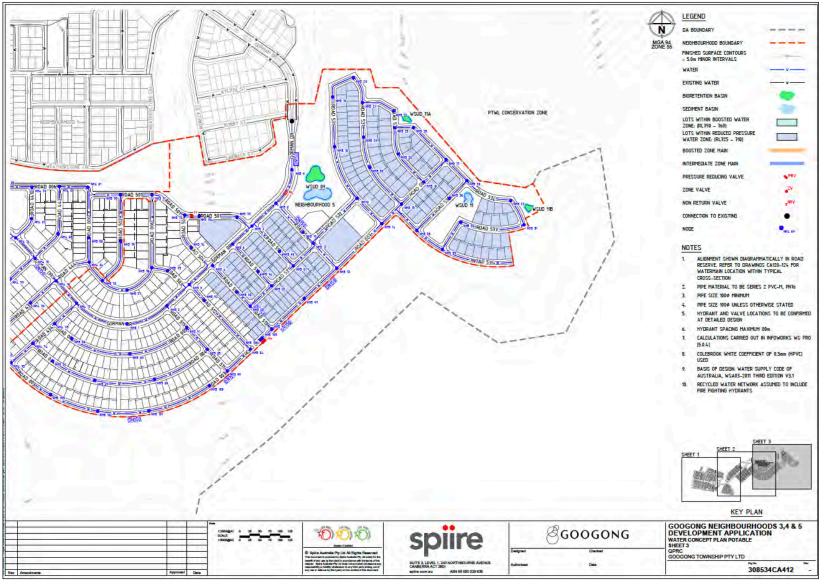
NH 3 Water Concept Plan. (Ember & Spiire, 2021)
